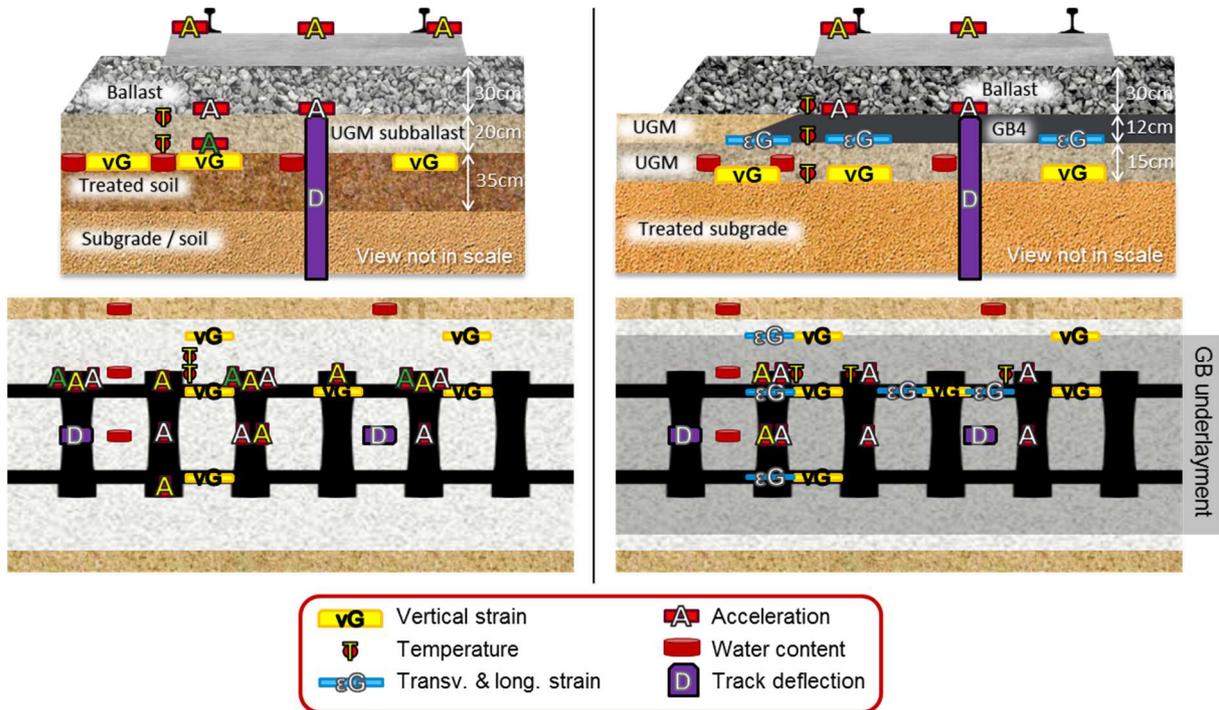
Scheme of the track structures and instrumentation of the BPL HSL: Instrumented section 2 in conventional UGM structure (left) and Instrumented section 4 with bituminous underlayerment (right) [9]
